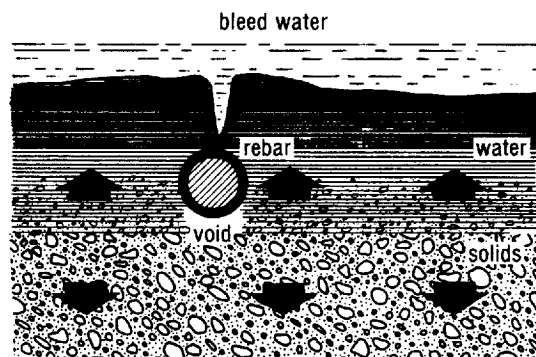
Plastic settlement cracking. Void beneath the rebar will reduce bond and provide a leak path.
